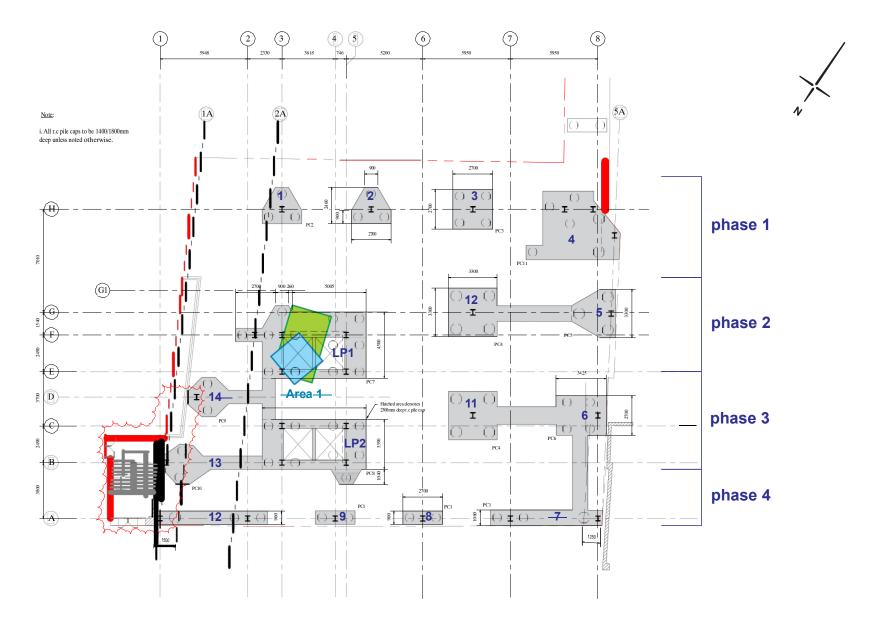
Site plan showing location of lift pit 1, proposed archaeological trench and oil tank
